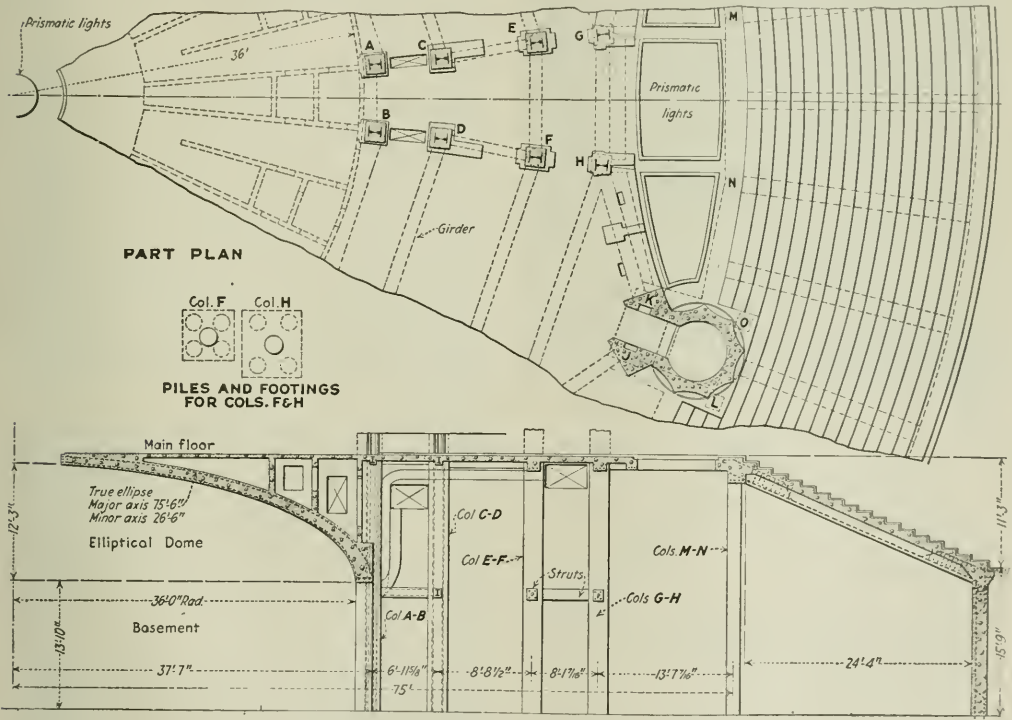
FLOOR DOME AND FOUNDATION COLUMNS
